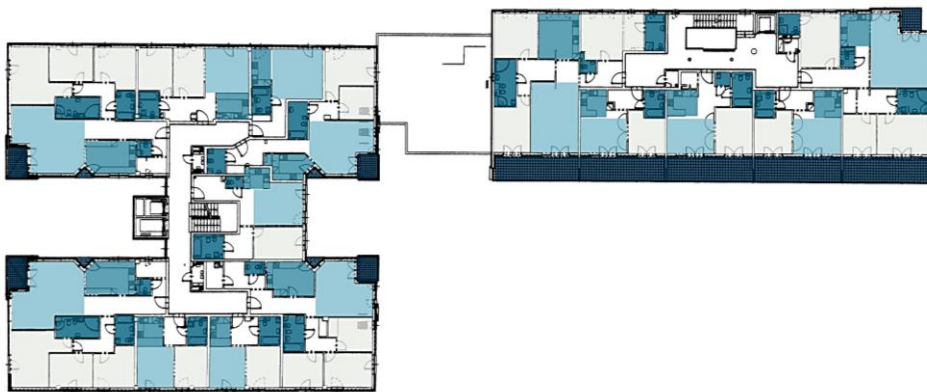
4: Office-Housing-Retail Buildings in Warsaw, 1998-2001. Site area 2567m² and building area 2128m² including 66 units [151]. Second floor plan, color coded by author.
